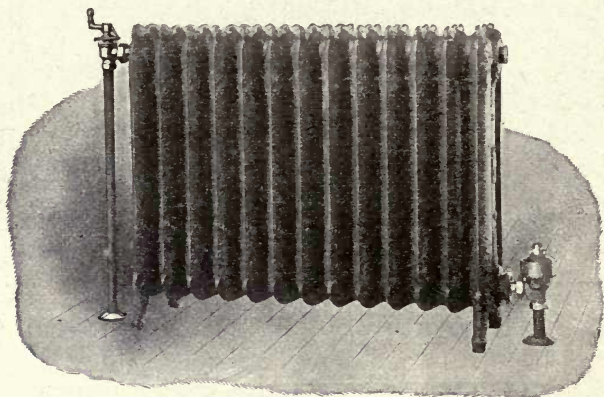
Radiator Equipped with Fractional Supply Valve and Automatic Return Valve.
